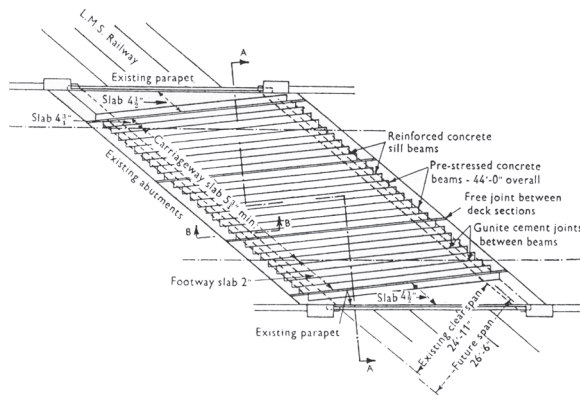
Plan of Bloodstone Bridge<sup>17</sup>
